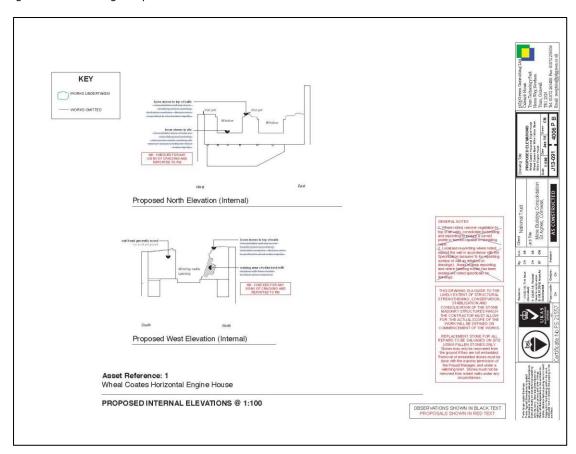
Northern and western internal elevations of Wheal Coates horizontal engine house.
